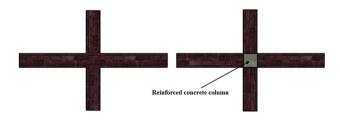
A cross-wall junction without and with a reinforced concrete column
